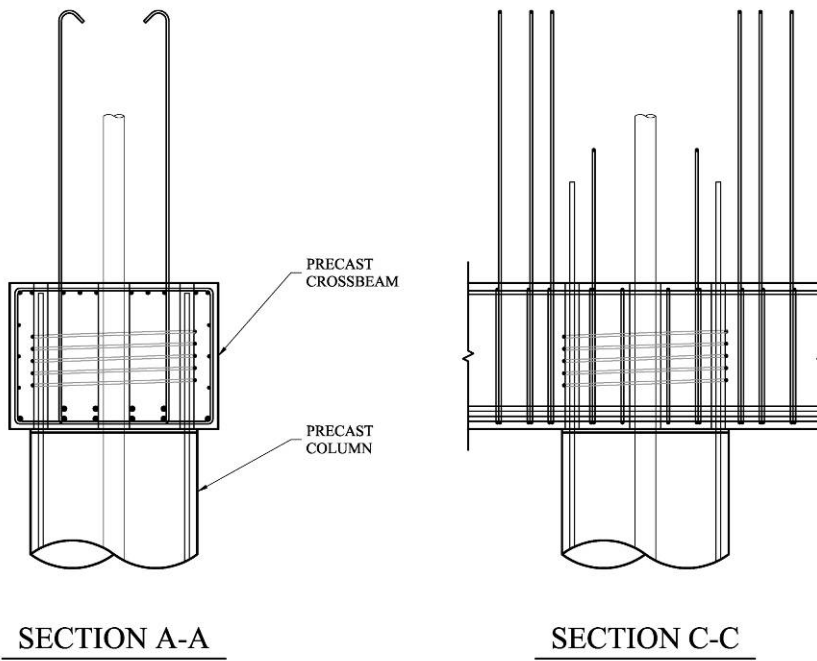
Column and Cap-Beam for Individual Splice Sleeve Connection for Hybrid Frames
